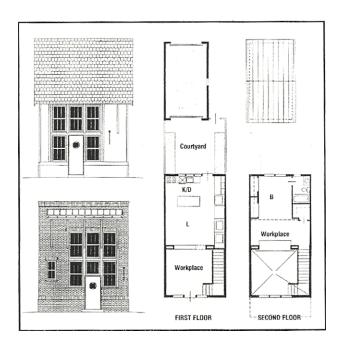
A typical lay-out of an upper storey residence and lower storey shop (Steutville, 5-18).
